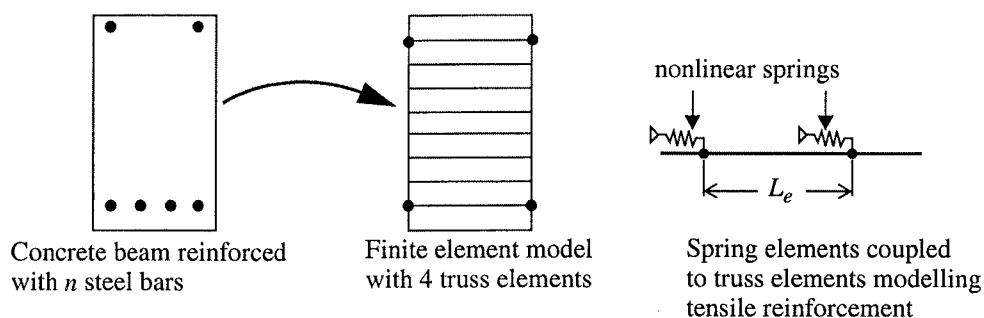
Finite element modelling of tensile reinforcement in concrete beam.
